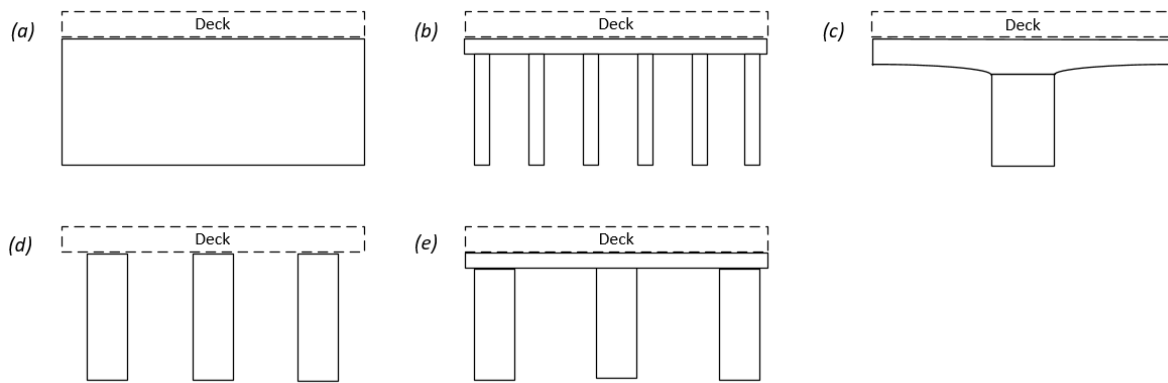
(a) Wall type (b) Capped pile (c) T-type (d) Multiple columns without cap (e) Cap and column
